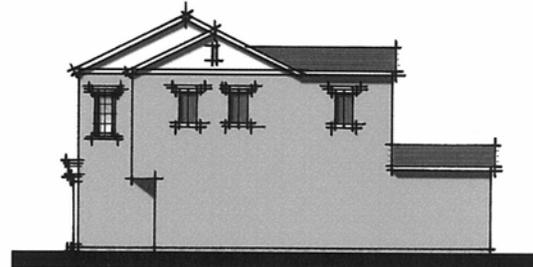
Plan 2 – Colonial Elevations
